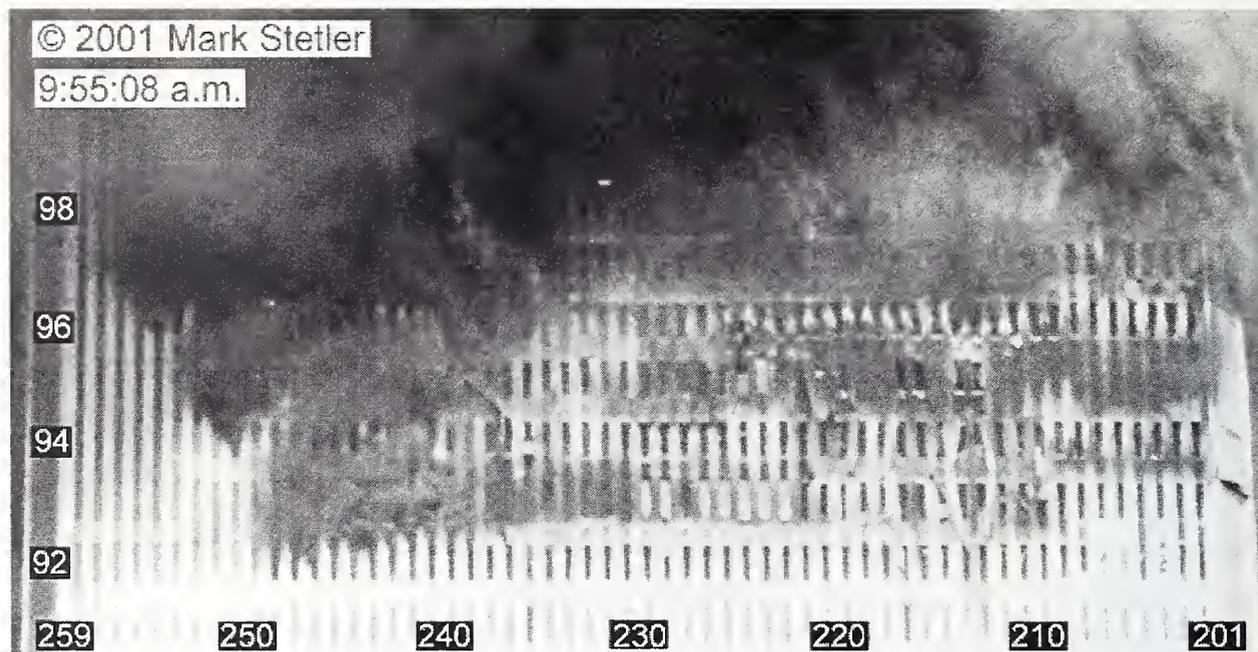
This photograph shows the east face of WTC 1 at 9:55:08 a.m. The original has been rotated, cropped, and enhanced. Column and floor number have been added.
